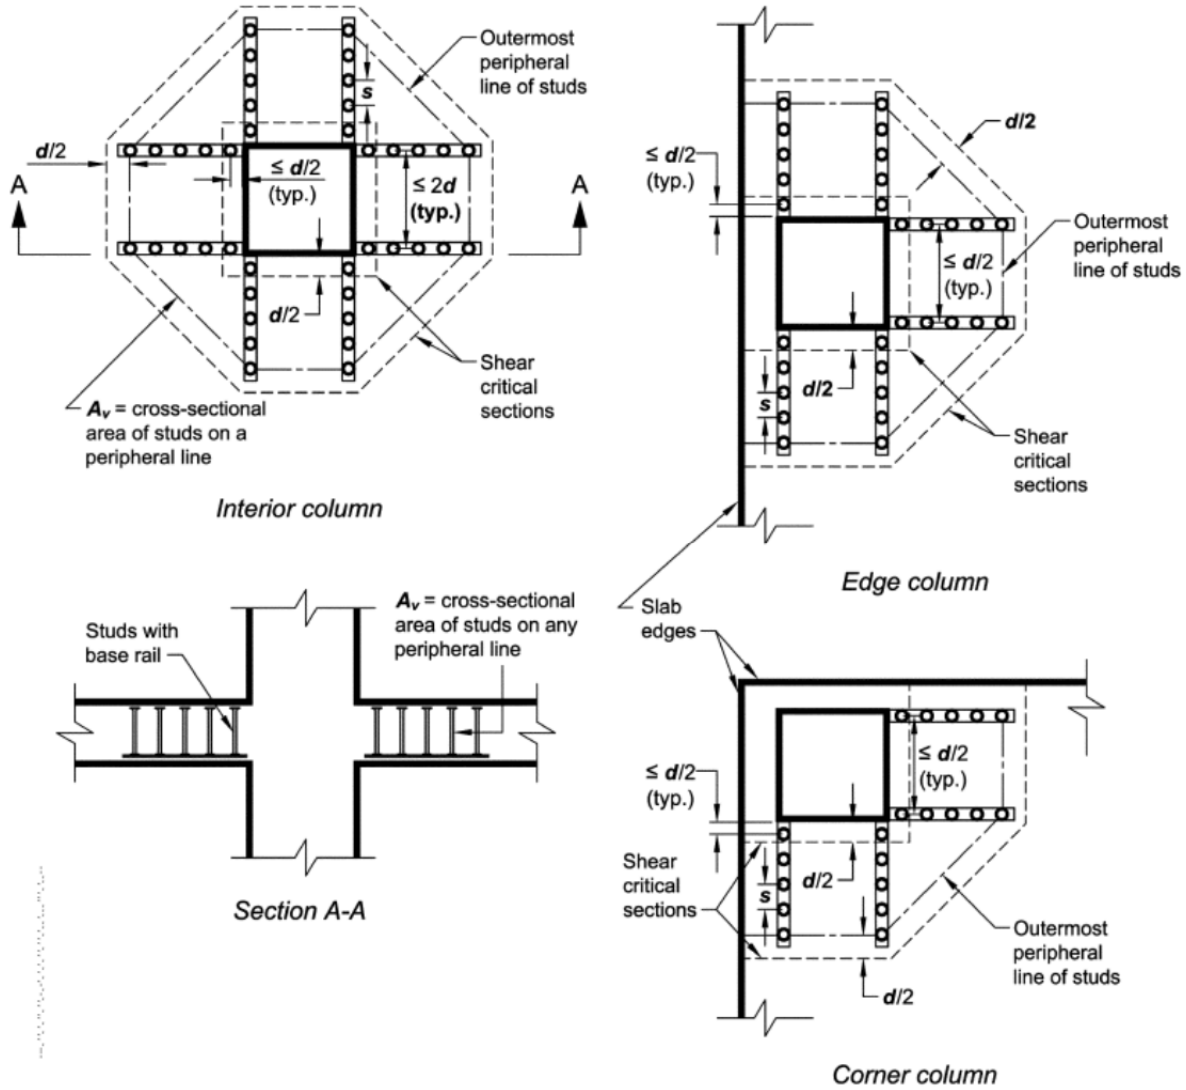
TYPICAL PJ'S PSR STUD RAIL REINFORCEMENT SYSTEM DETAILS
